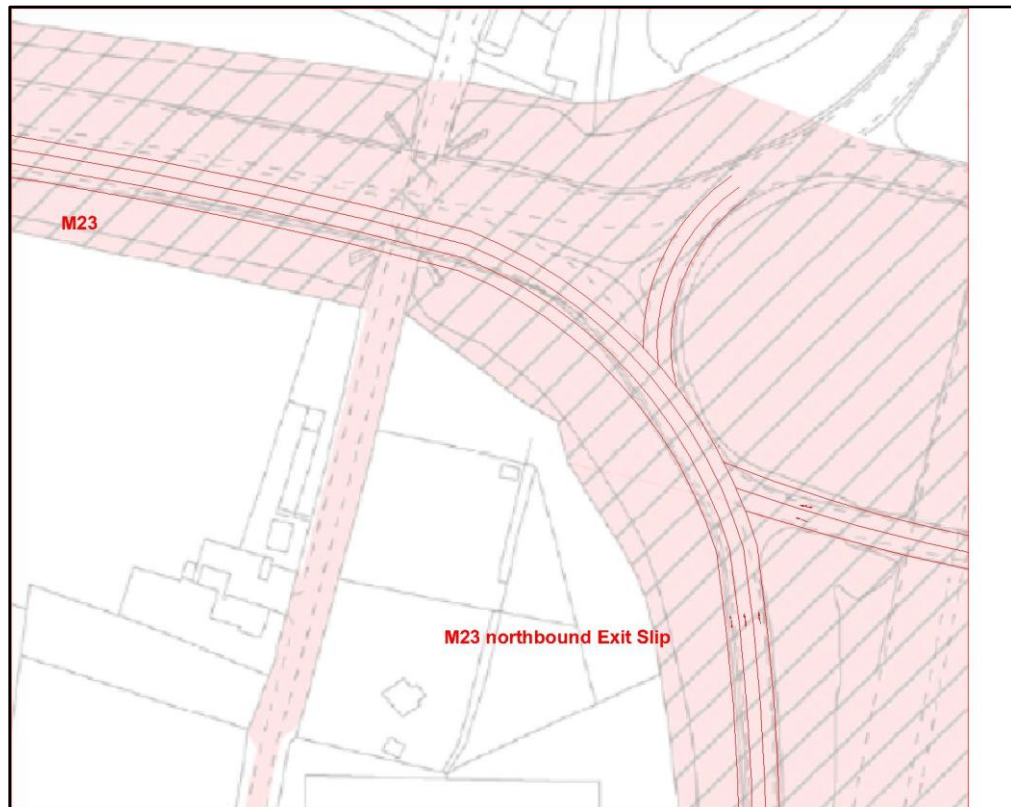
M23 Junction 9 Gatwick Airport – Signal Approach Widening and Localised Carriageway Widening
